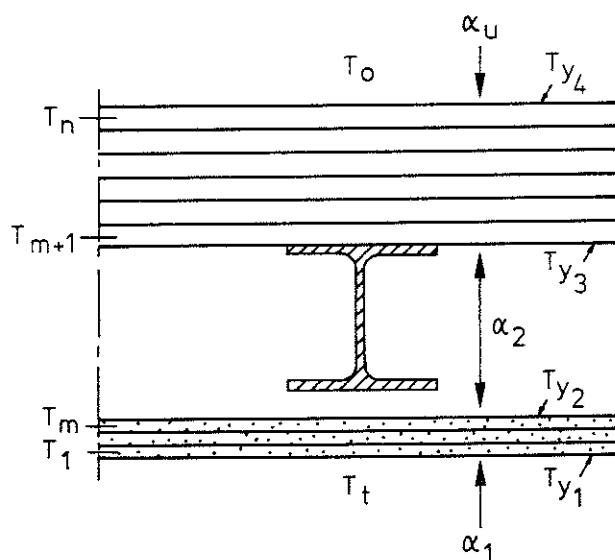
Division of slab and suspended ceiling into elements
